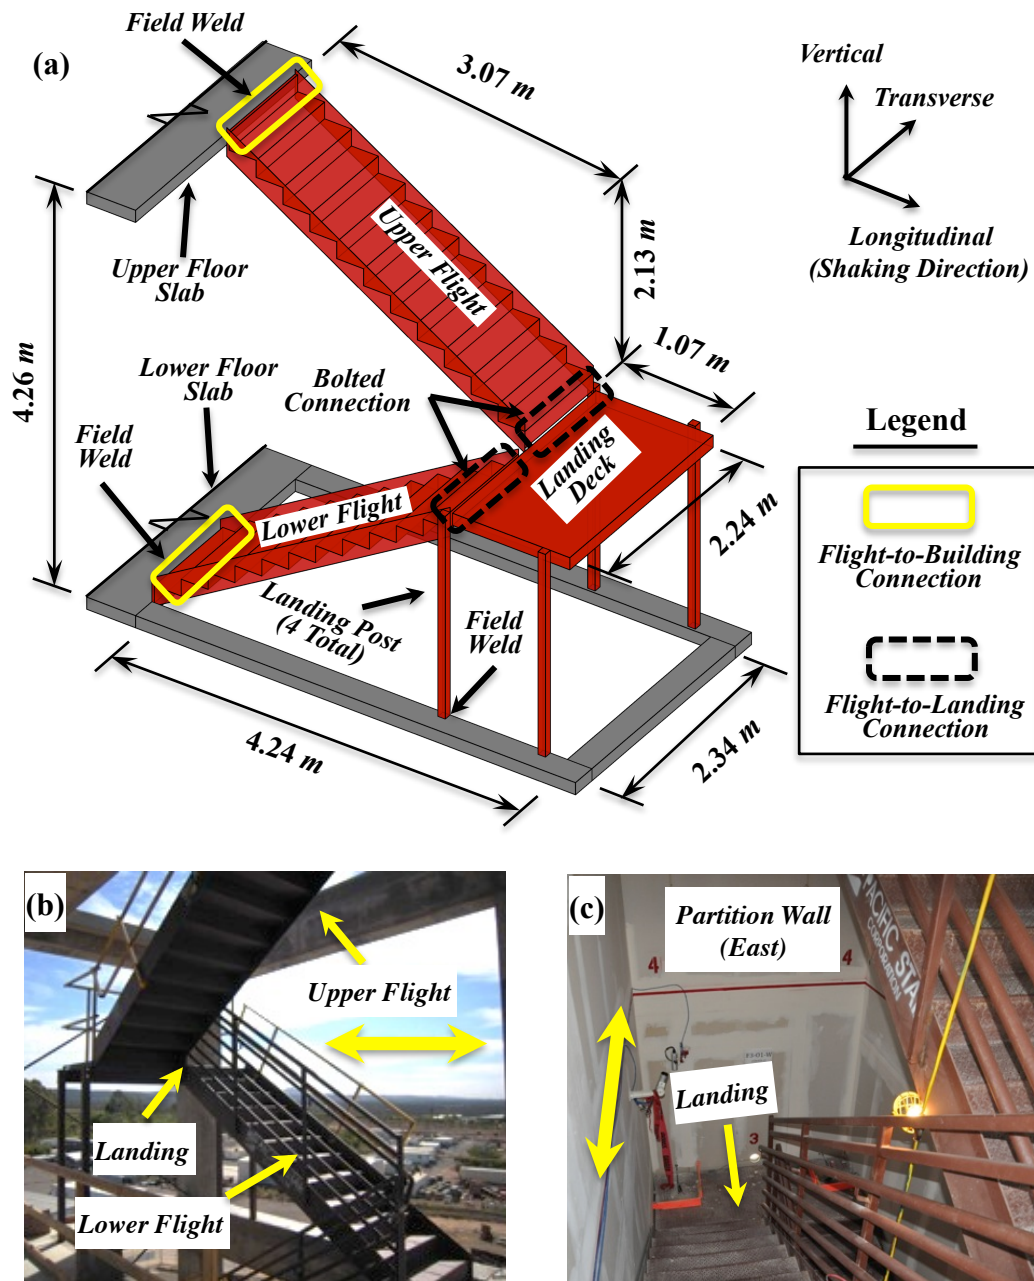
Stair layout: (a) three-dimensional schematic of the stair (handrail not shown for clarity), (b) photograph of the stair installed in place during structural skeleton completion, and (c) photograph of the stairwell at building completion (note: double-headed arrow denotes the direction of input motion applied at the base of the test building).
